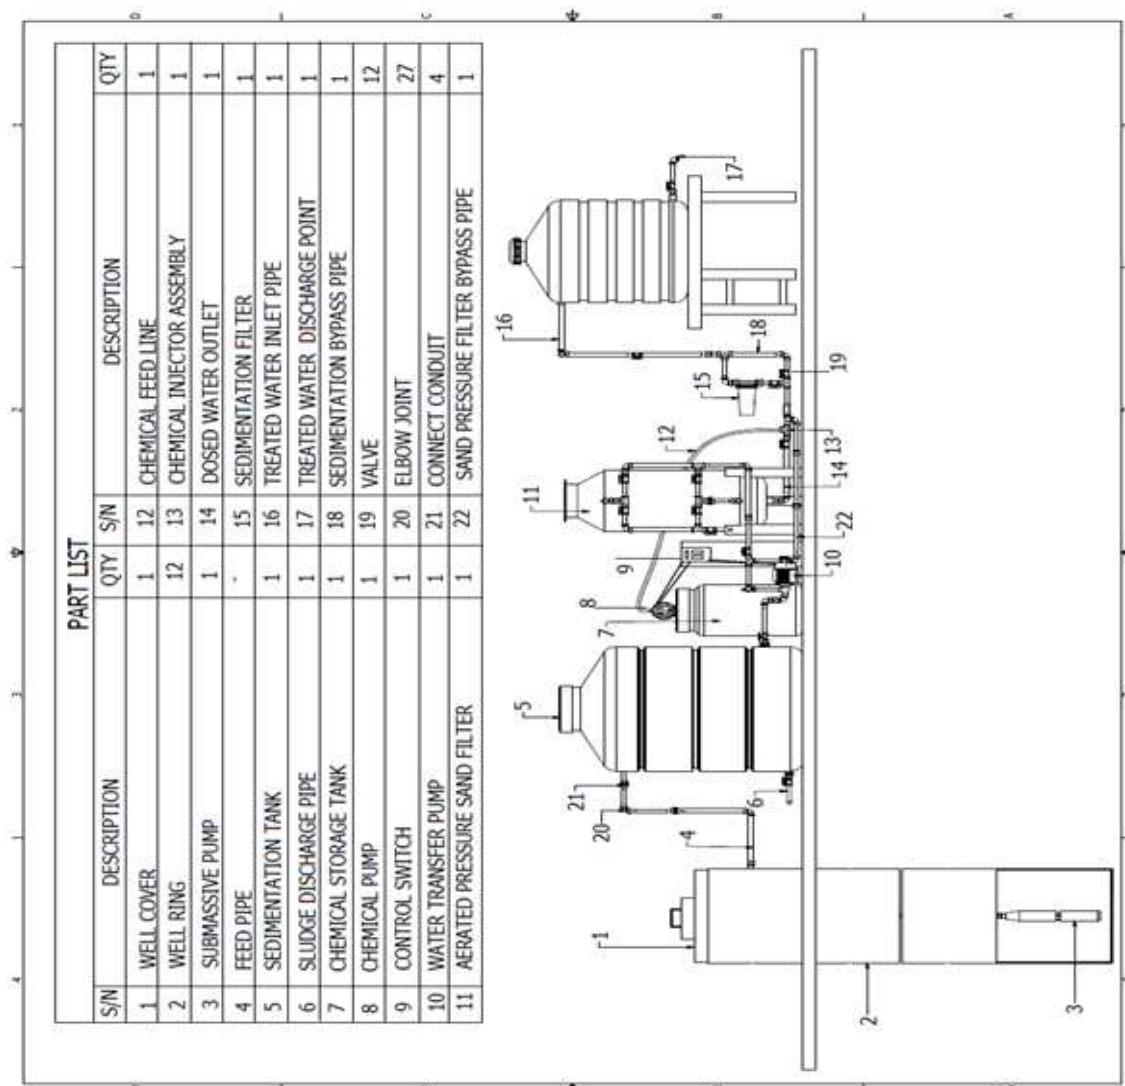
A Schematic Diagram showing the Layout of Domestic Well-Water Treatment Plants Installation.
